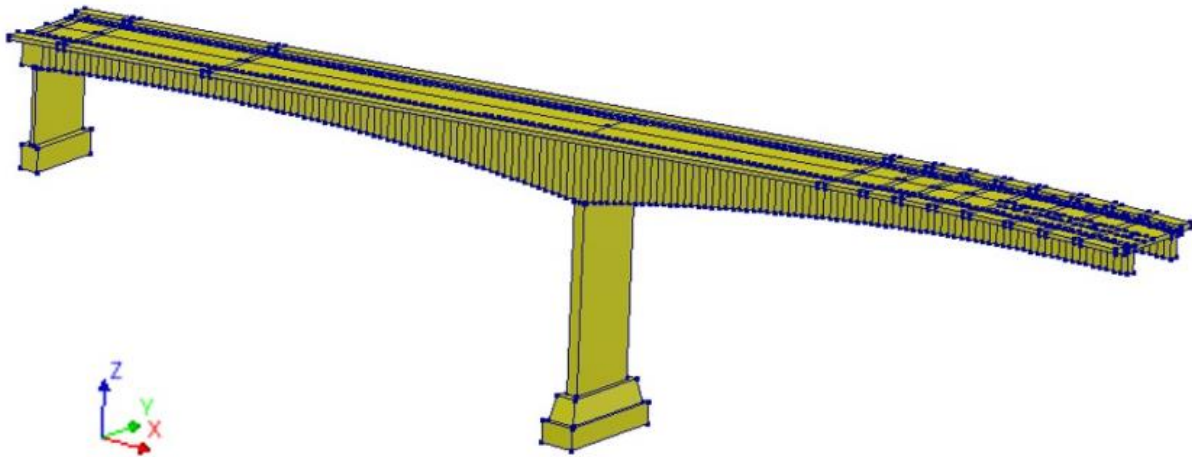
Numerical model of the Herøysund Bridge (Source: [1])
